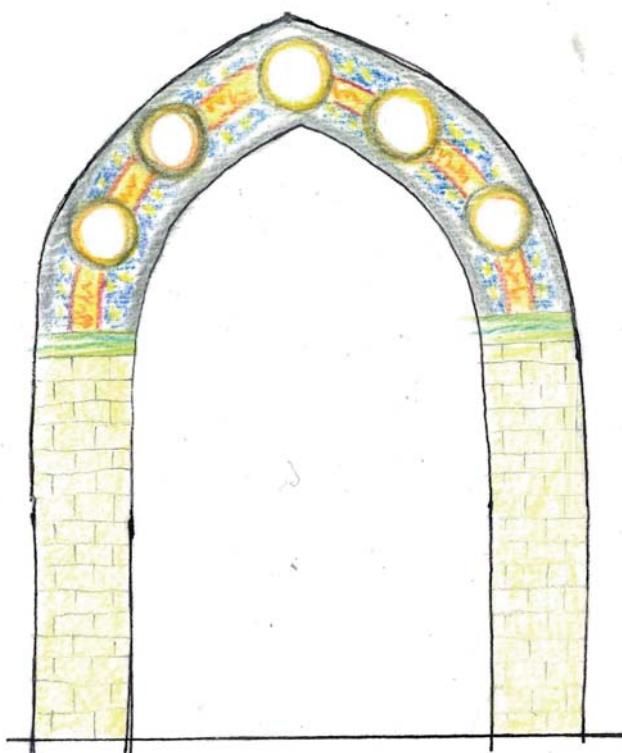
ADDITIONAL WINDOW - 1:2
